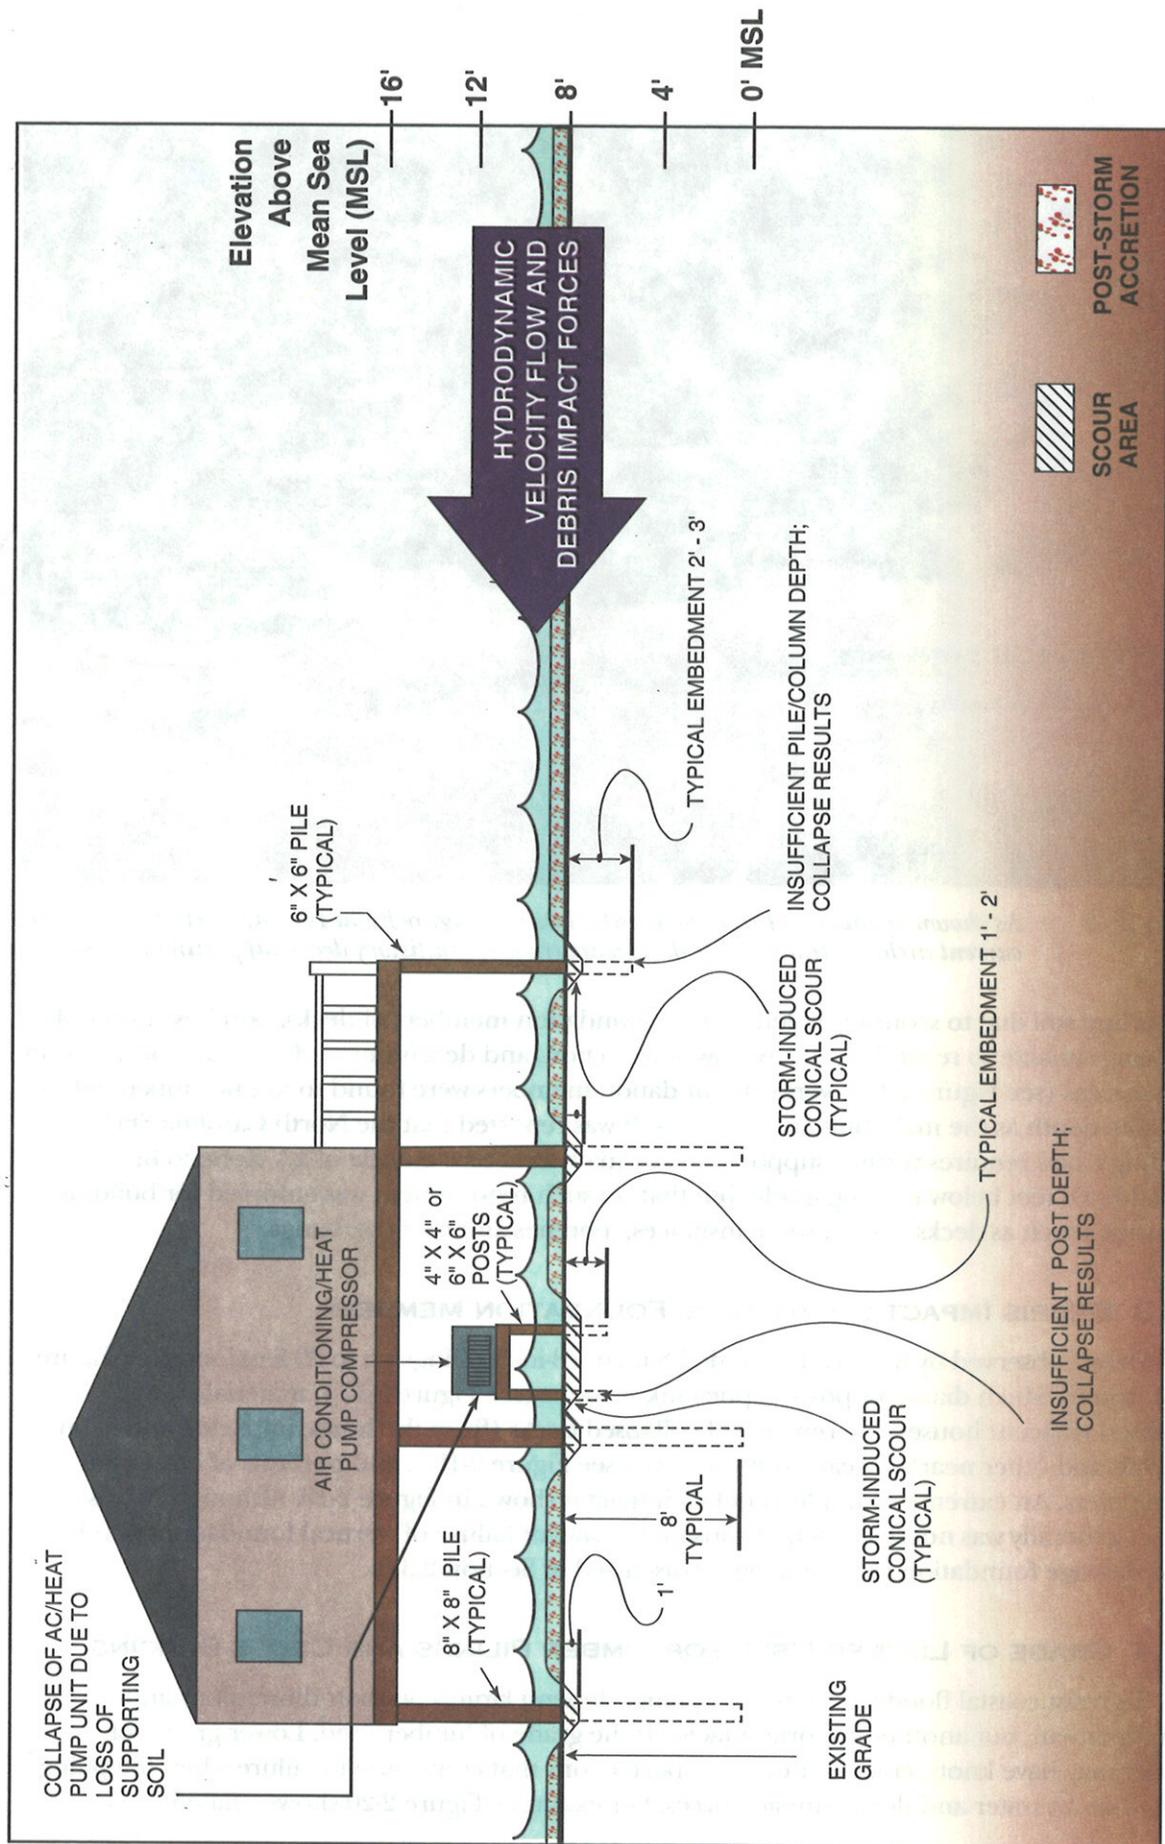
Typical failure of deck / roof overhang and air conditioning / heat pump compressor platform for landward home.
